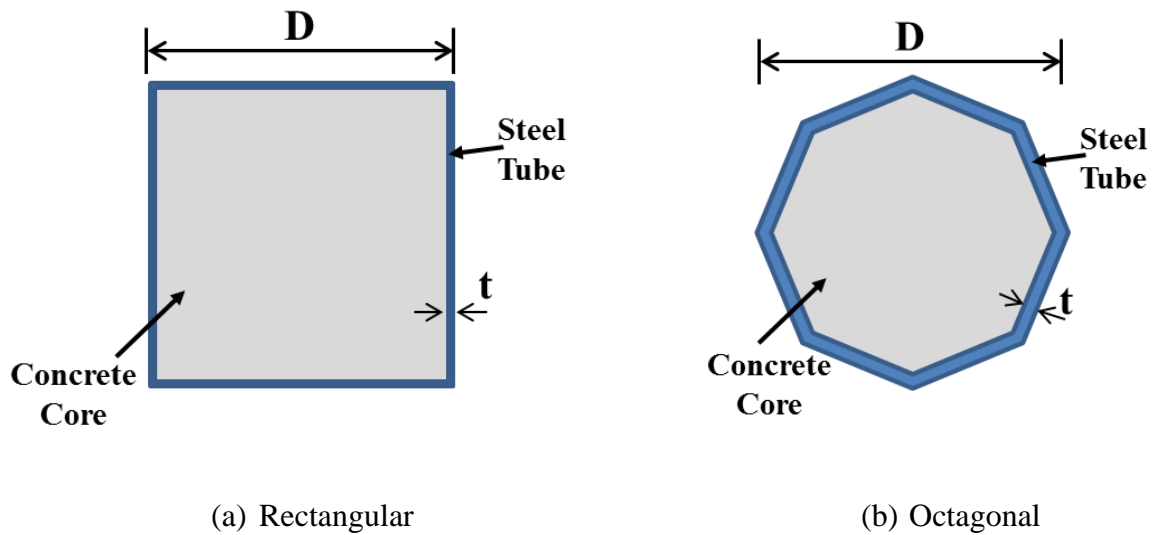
Concrete-filled-tubular (CFT) columns with large-size sections
